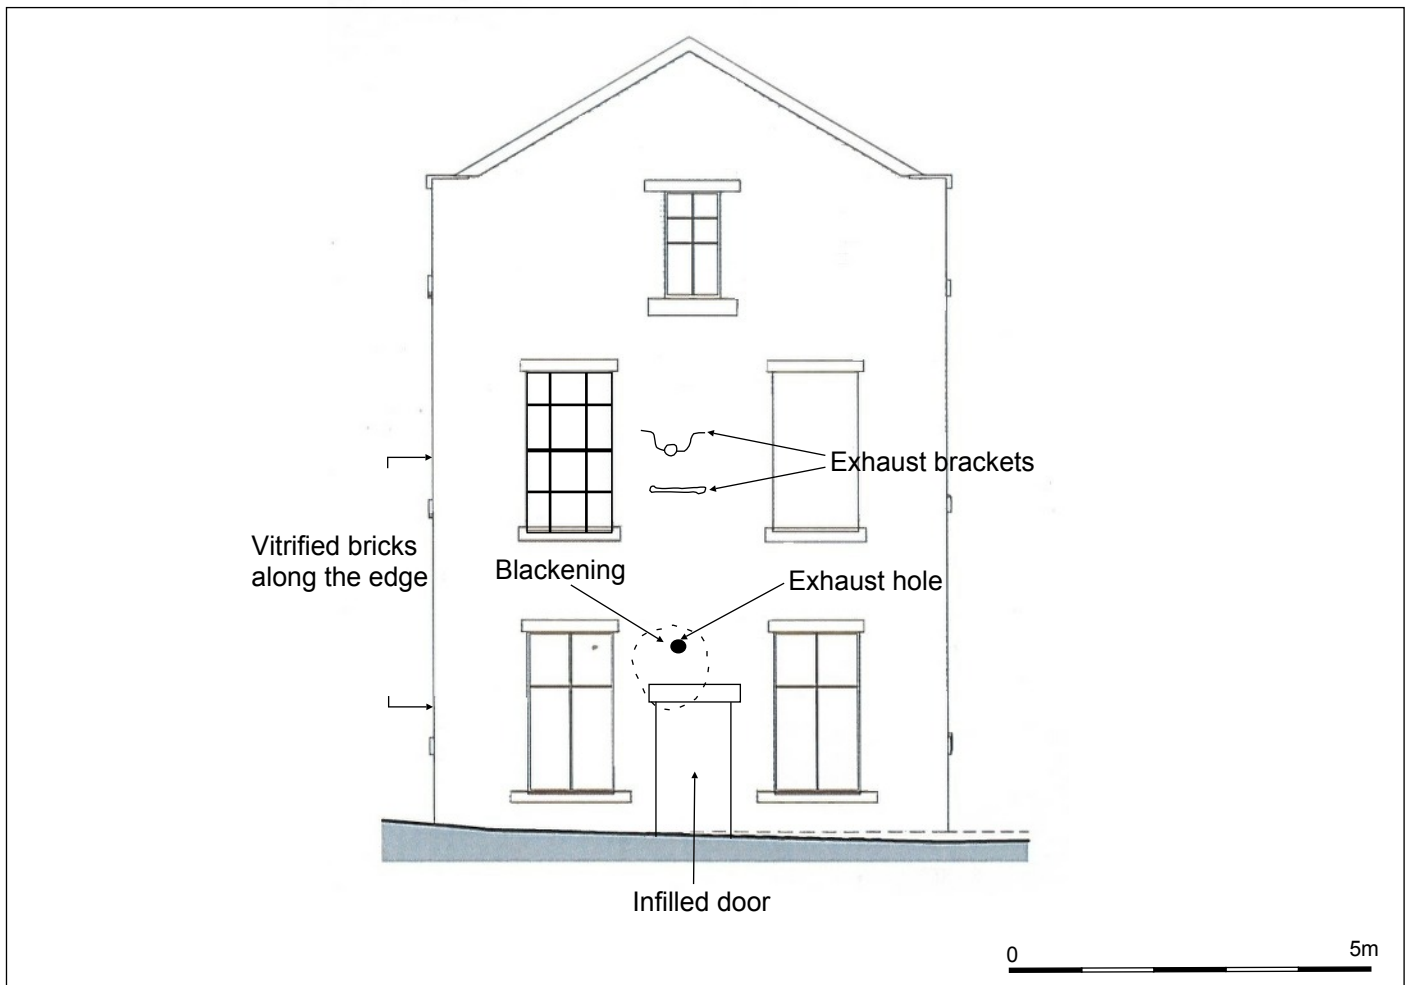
South elevation of the north wing, based on a drawing provided by the client.
